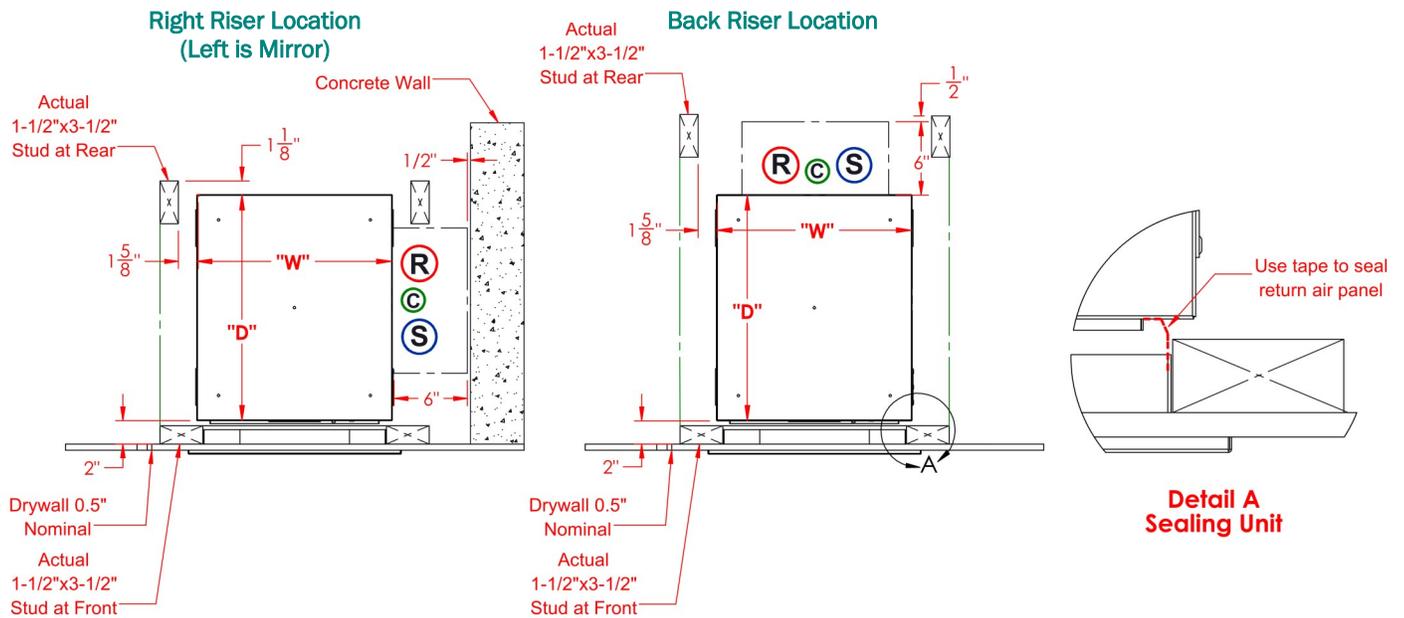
Acoustic Furring Dimensional Drawing
